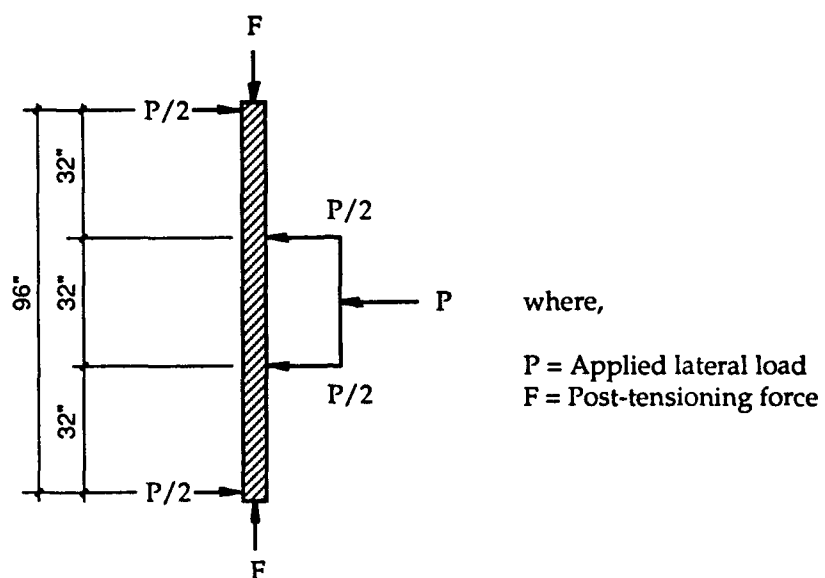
Loading Diagram of Post-Tensioned Wall Panel.
